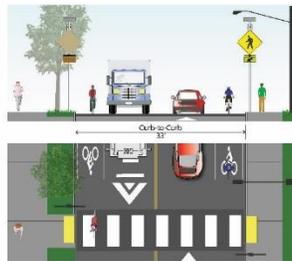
Preferred Alternative - Upgraded Raised Crossing at Broadway and Spring Street (Plan View)
